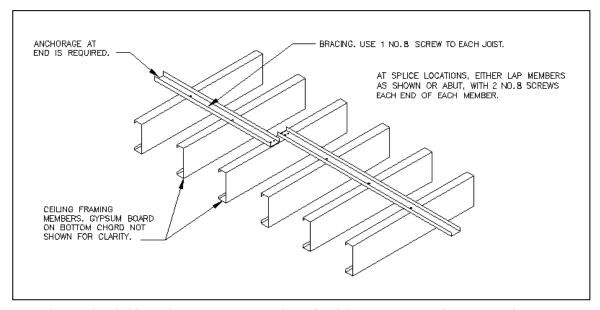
Ceiling Joist Top Flange Bracing With C-Shape, Track or Cold-Rolled Channel
